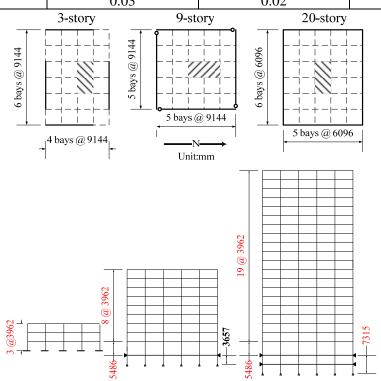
Floor plans (showing layouts of moment resisting frames in unbroken lines) and elevations of SAC buildings; 3-, 9-, and 20-story from left to right
